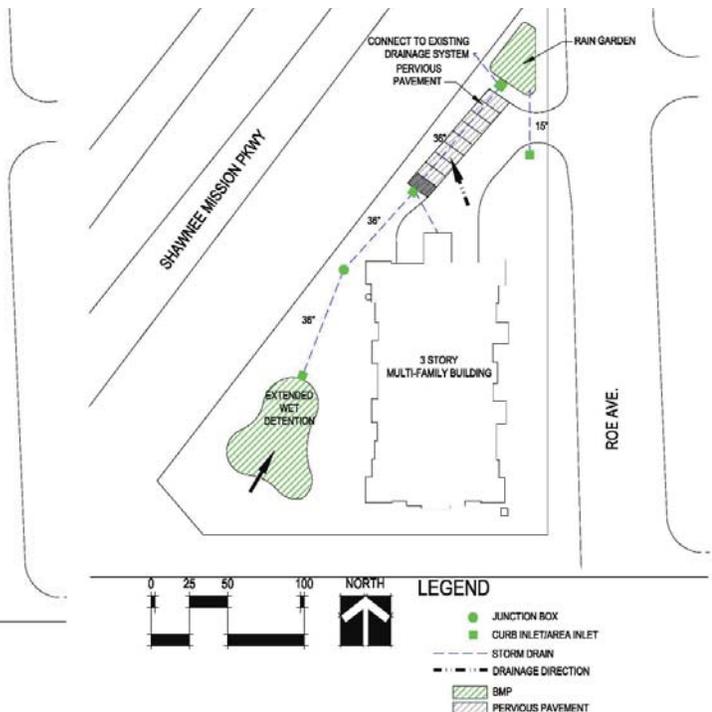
Roe Avenue Multi-Family Development: LID Site Layout
